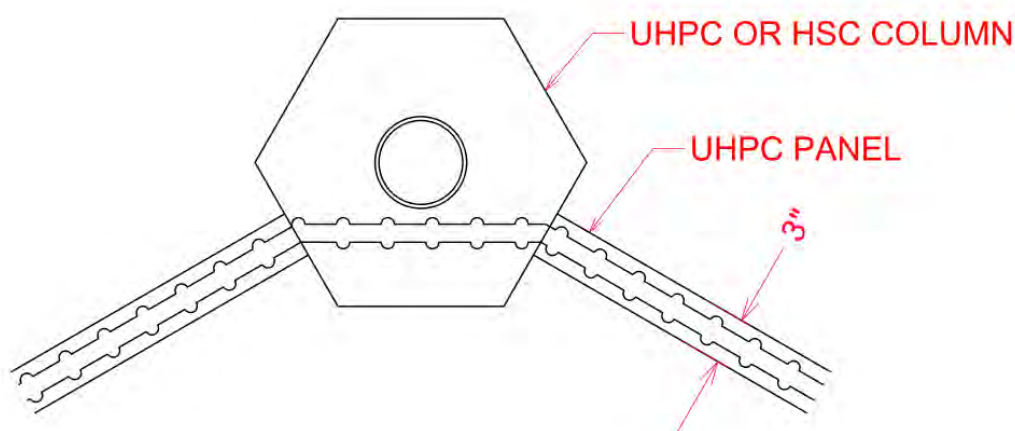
Horizontally Post-Tensioned Connection Detail
